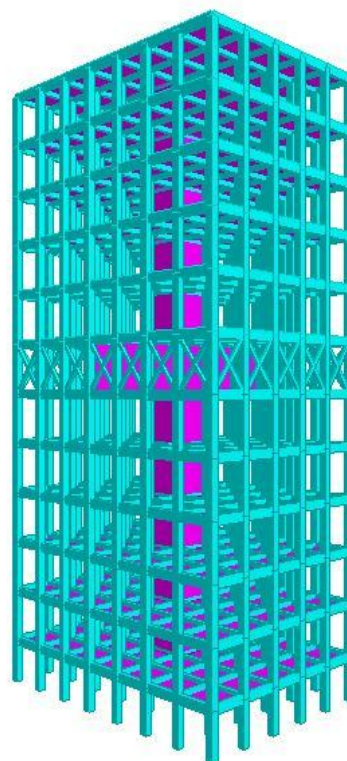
Actual 3D view of case (RA5) Residential Apartment with Shear core outrigger and truss belt supported system after rendering
